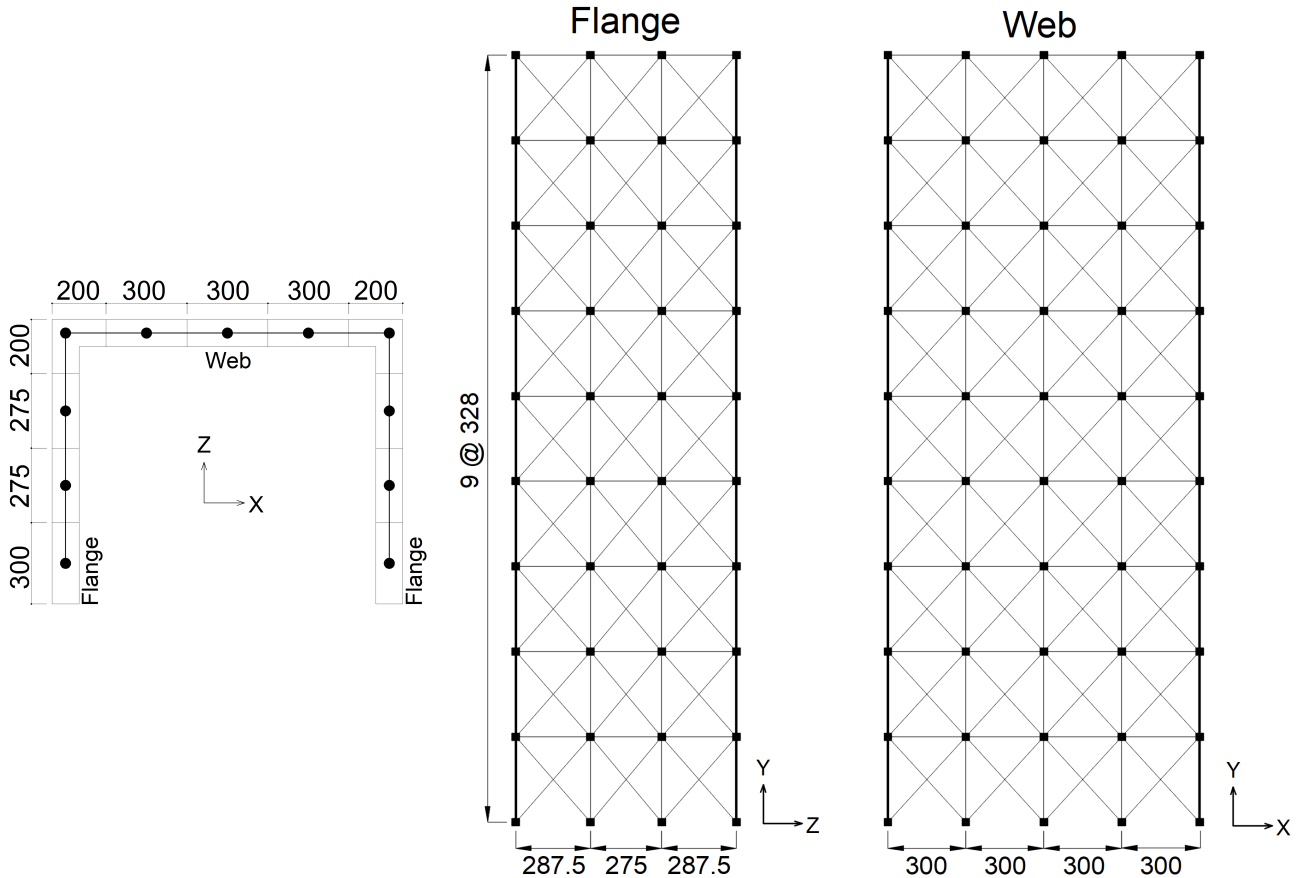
Plan and elevation views of the beam-truss model for TUB [Unit: mm].
